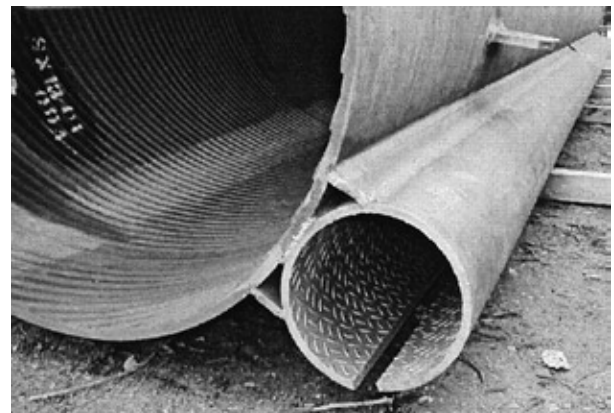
High strength pipe-junction pipe and steel pipe with inner rib
